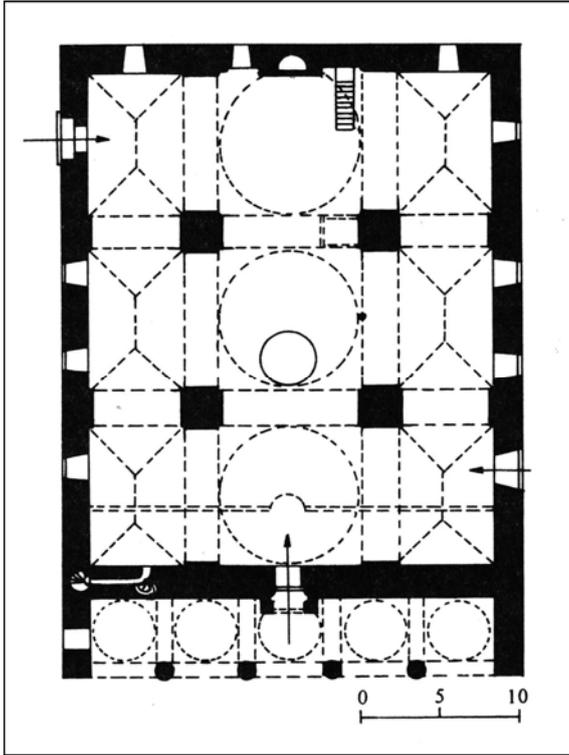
Floor plan of Muradiye mosque in Filibe (plan M. Staynova)
